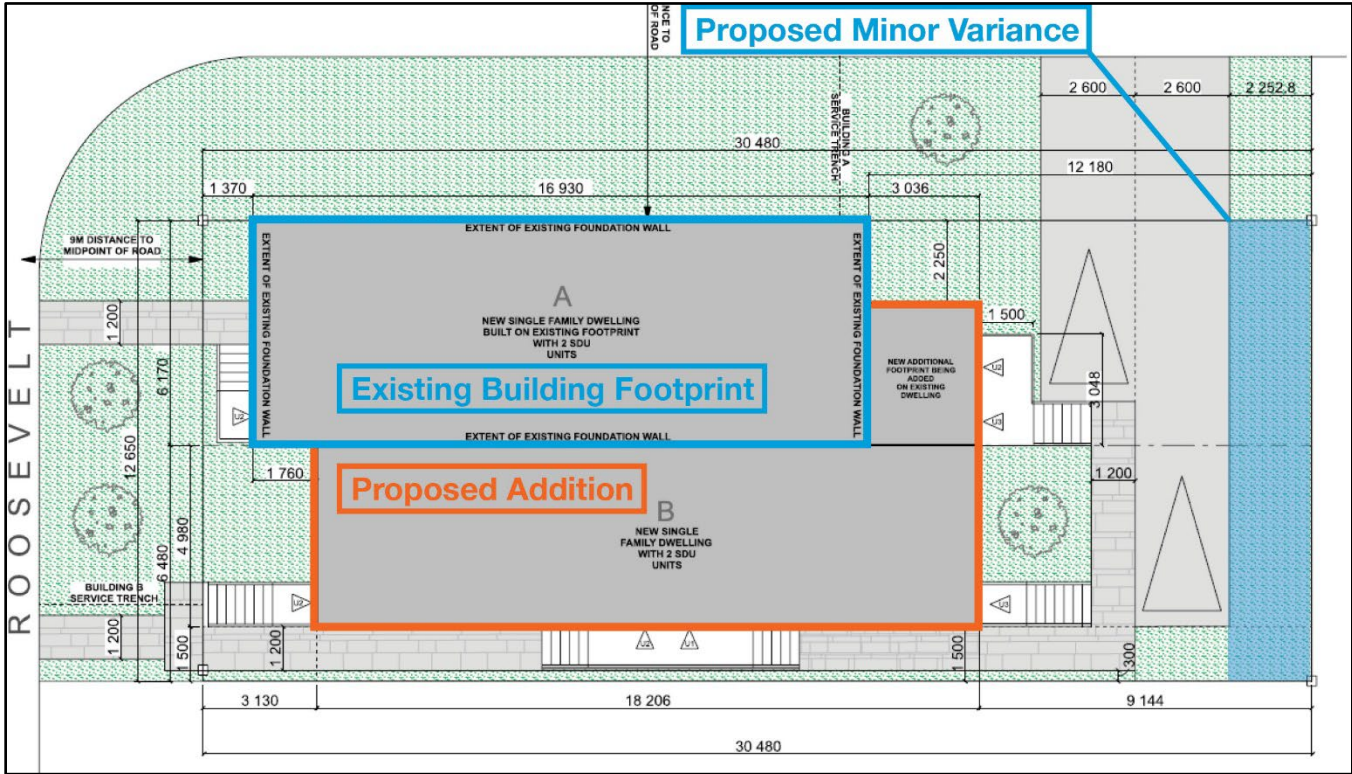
Proposed Site Plan (area in blue showing the proposed landscape buffer along the rear property line)
